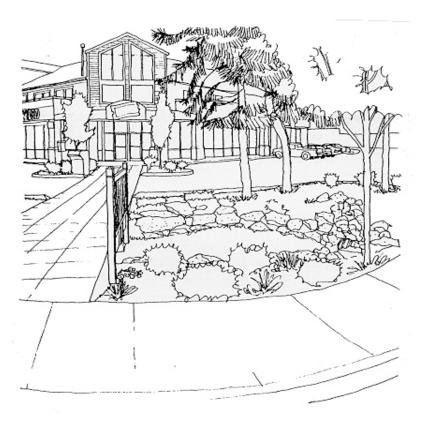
(d). This mixed-use development has a strong pedestrian connection to the street because of its direct pedestrian connection.
